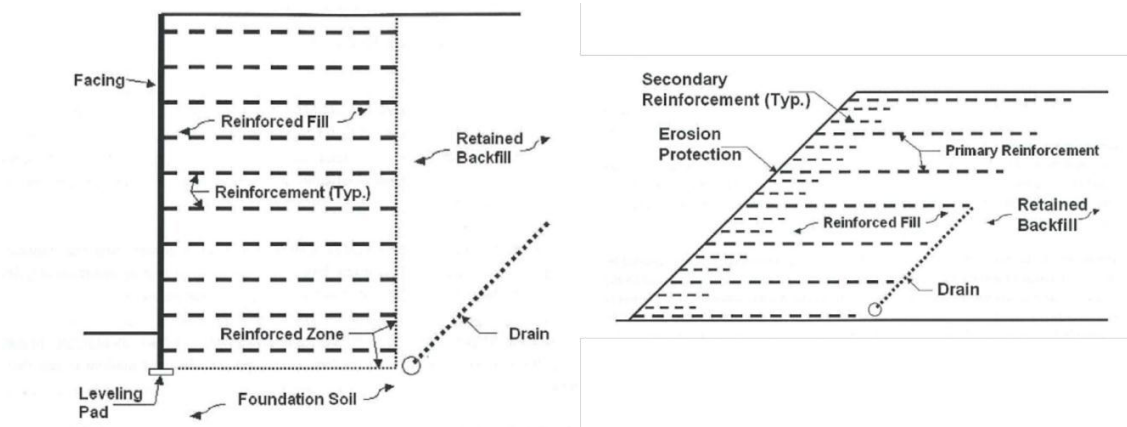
Generic cross section of reinforced soil walls and slopes (source Berg et al., 2009).
